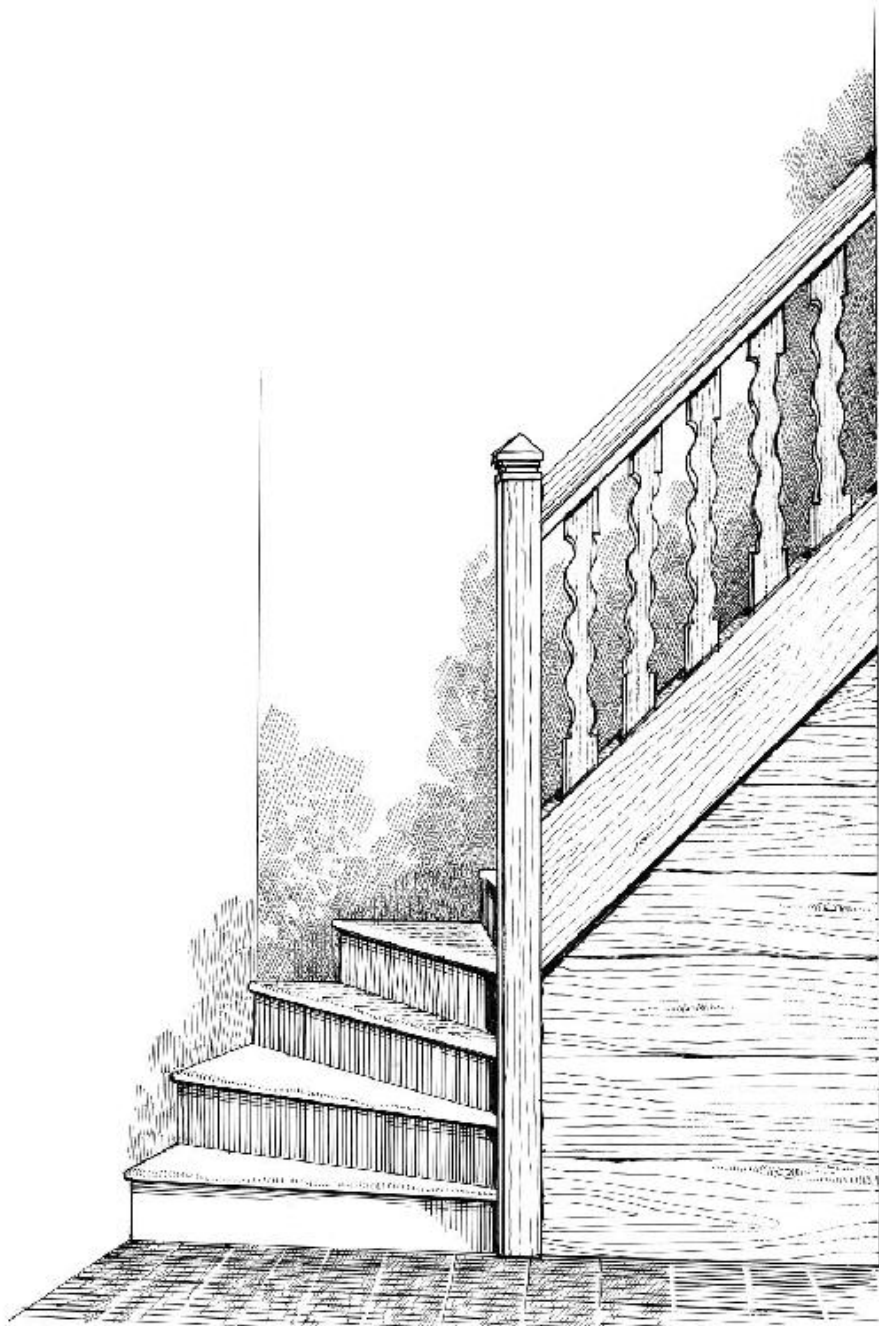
Detail of the surviving 17th-century stair within 10–11 High Town and its profile or 'splat' balusters
